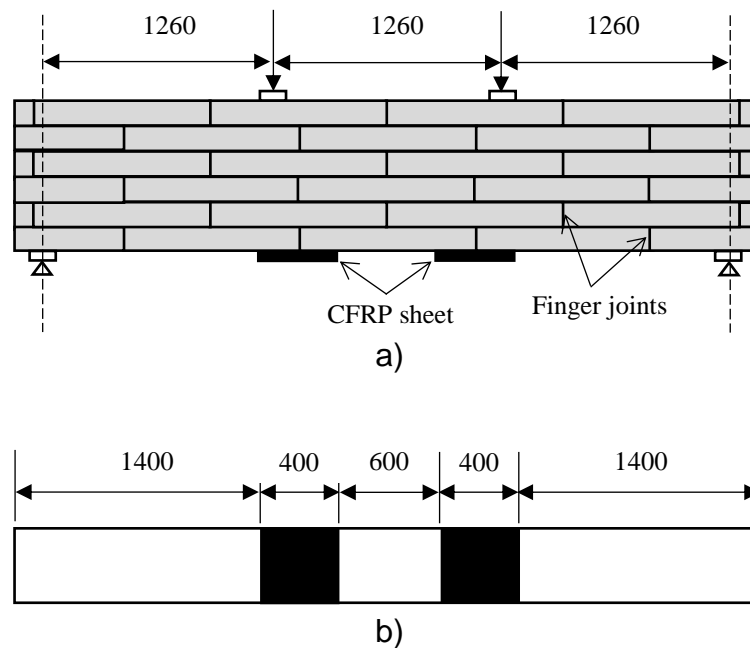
Layout of Beam-FJ a) side view; b) bottom view
